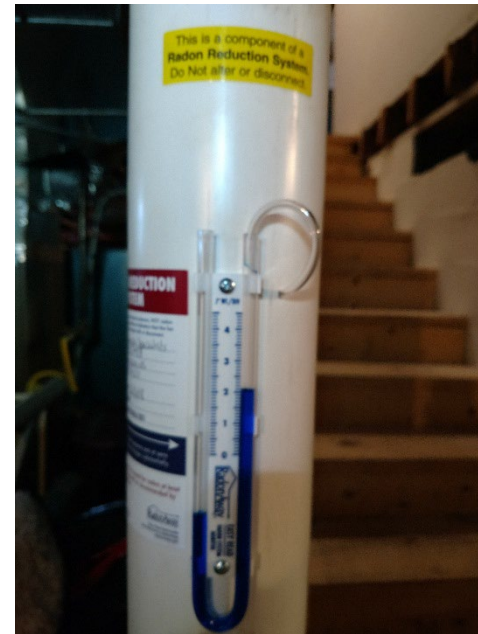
A U-tube manometer (reading 2.1 in of w.c.) and system labels installed on extraction point vertical.
